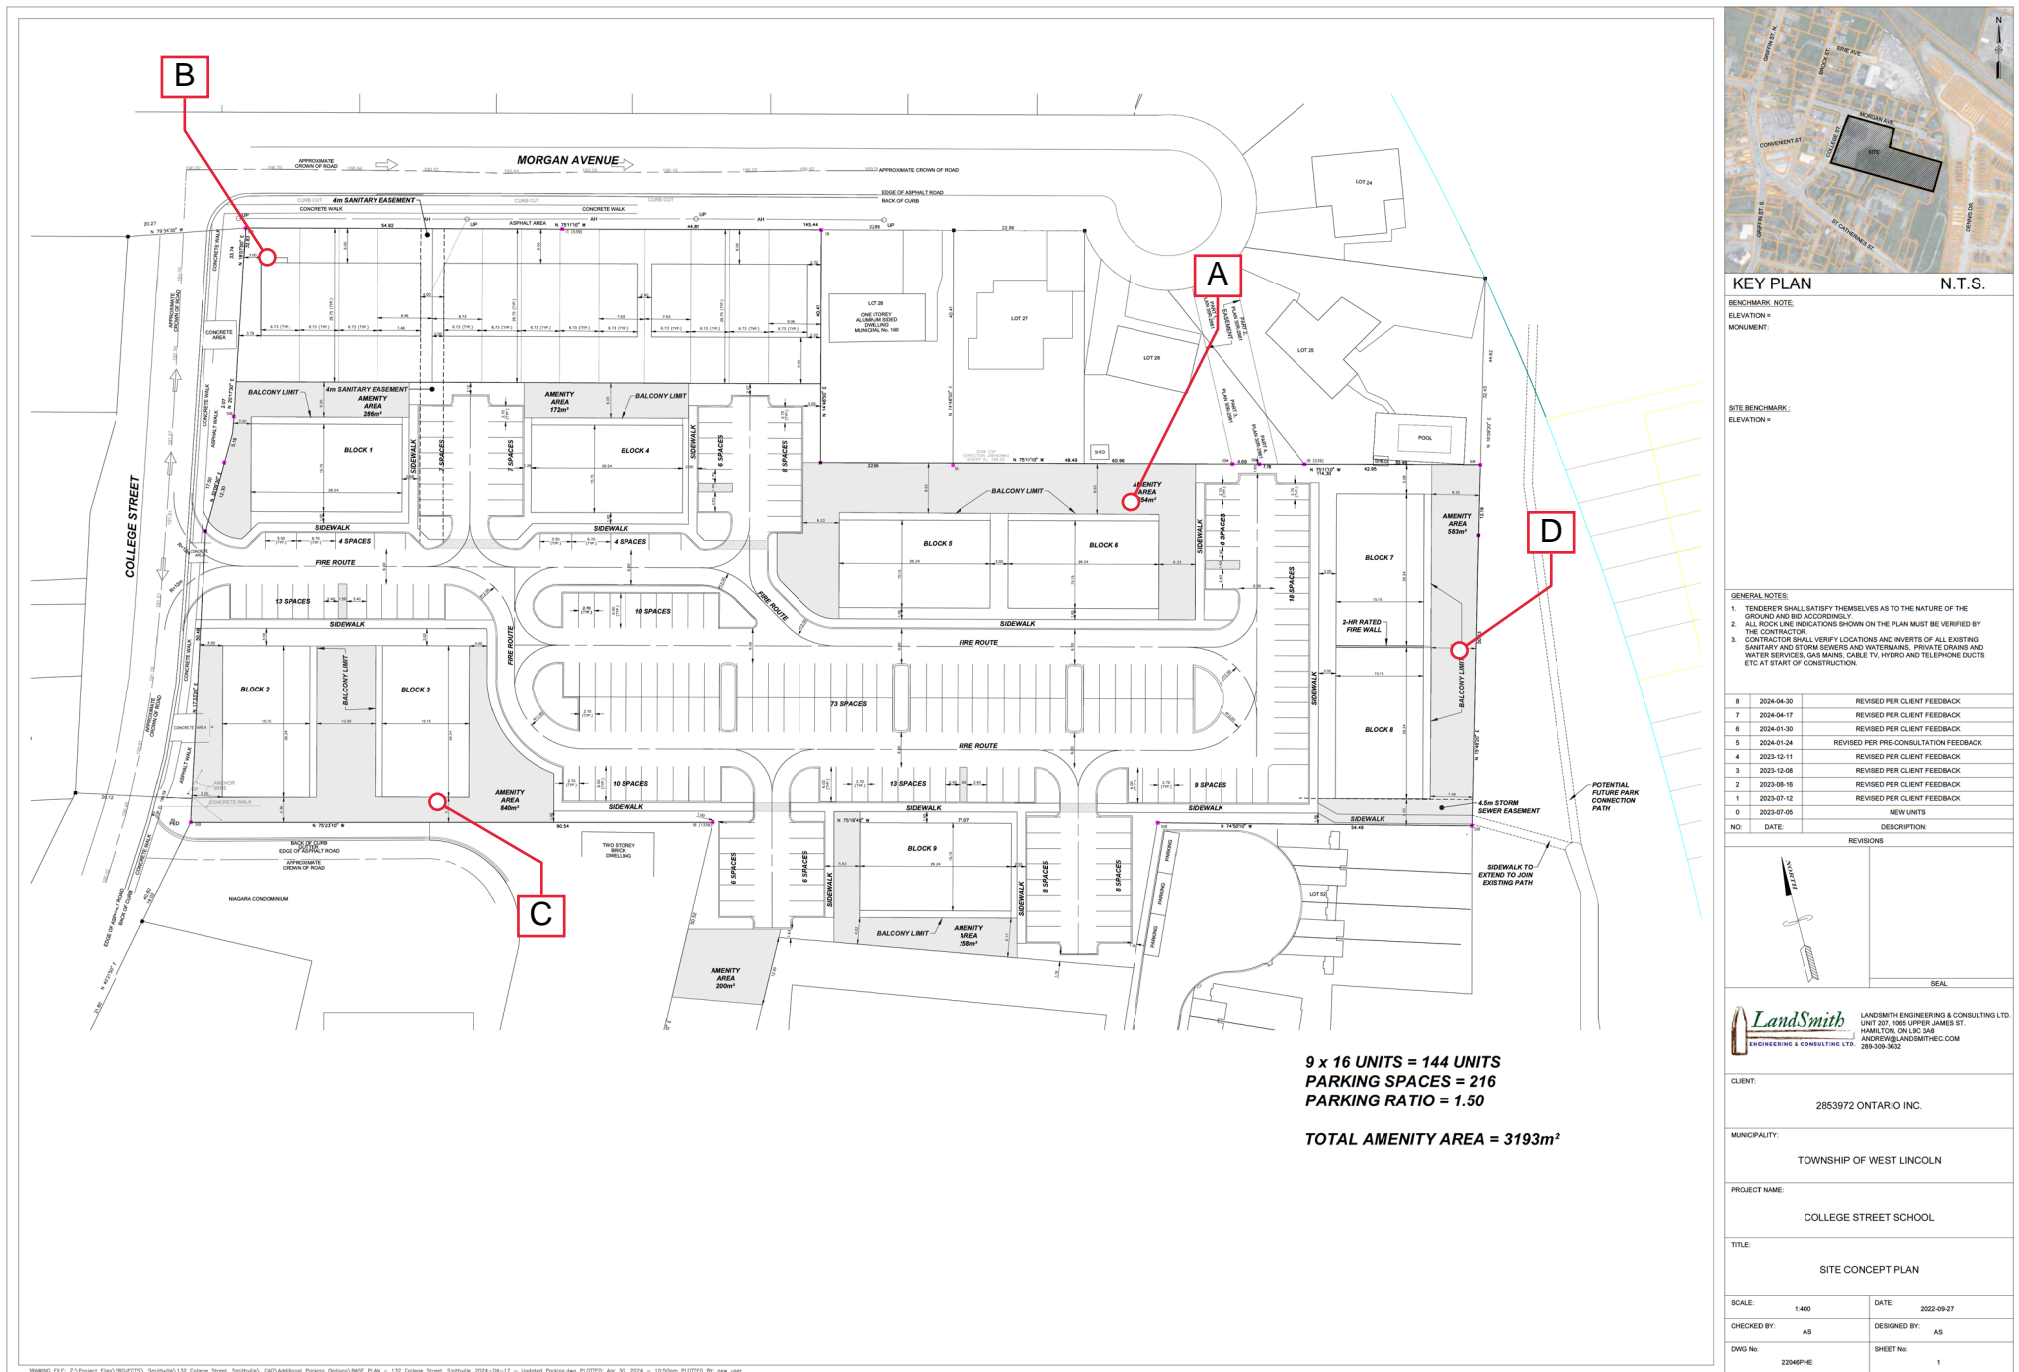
Proposed Concept Plan Showing Prediction Locations
